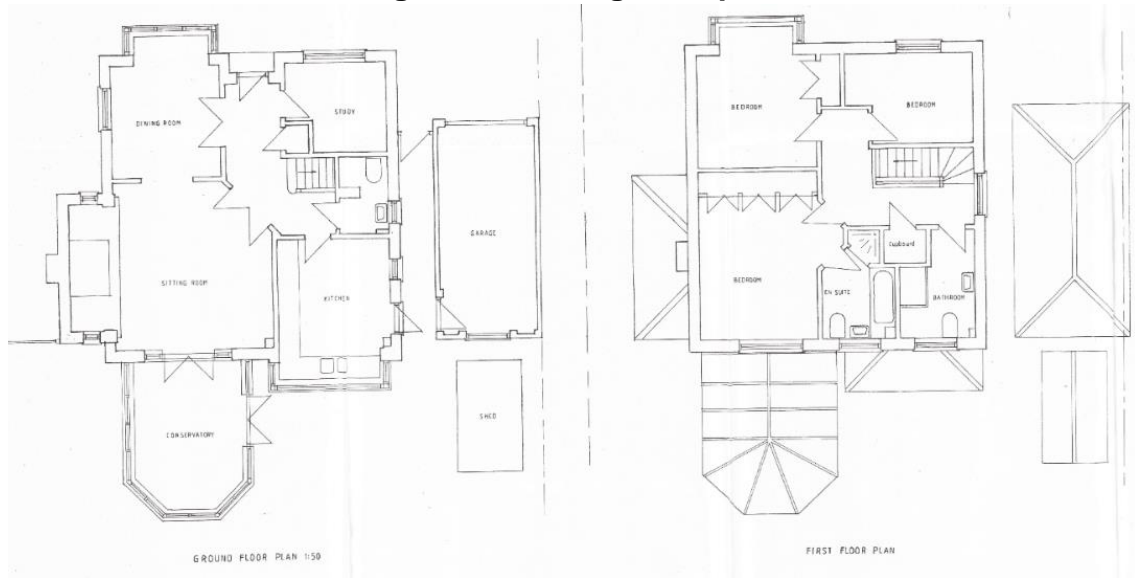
floor plans as approved under ref: 22/02271/FULL6
